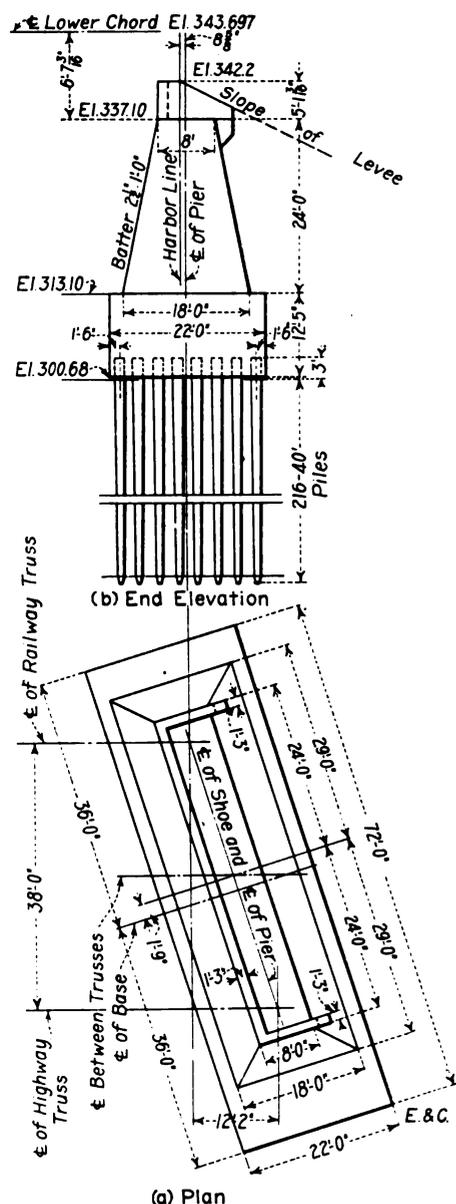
Plan and End Elevation of Pier No. (at West Harbor Line) of East Kansas Ave. Bridge.
